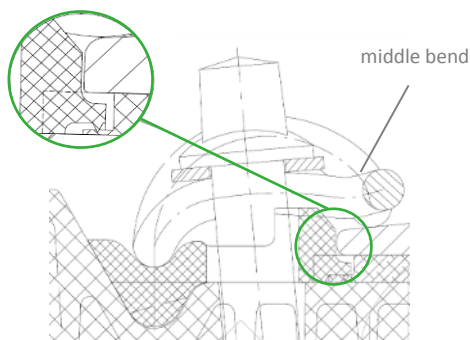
DETAIL ANTI-TILTING PROTECTION
